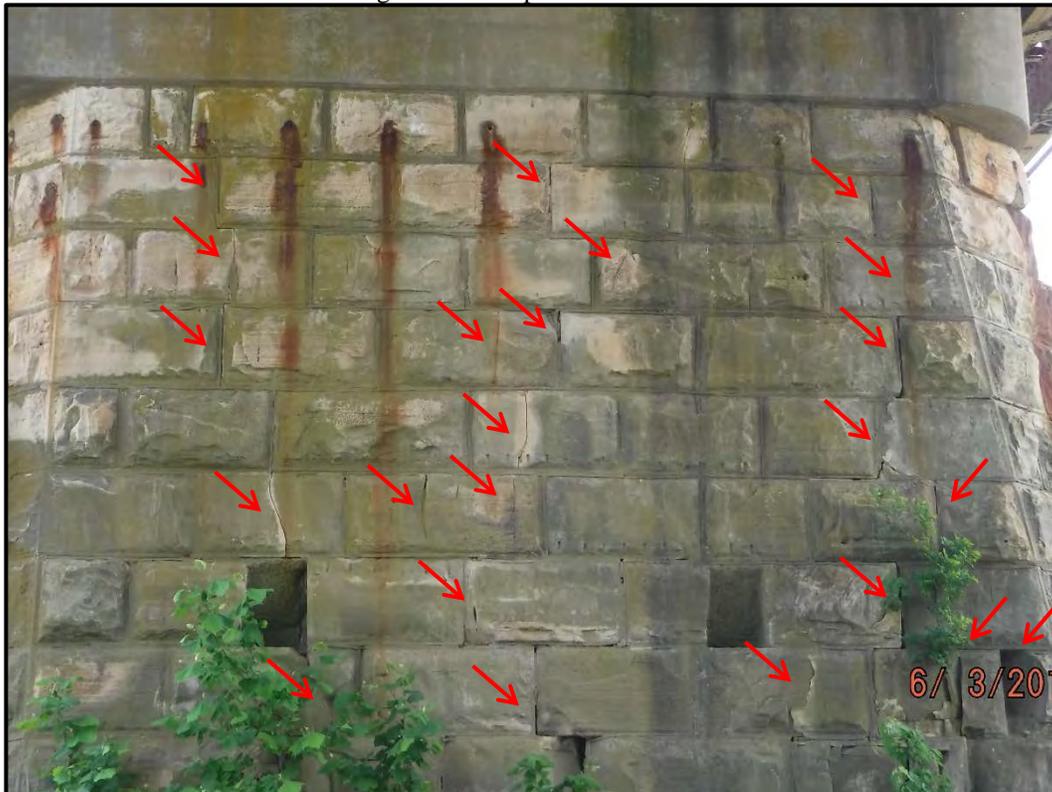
West face of Pier 5 has rust staining from the top row of stones and 3 full height vertical cracks, one in the middle and then one on each end.
